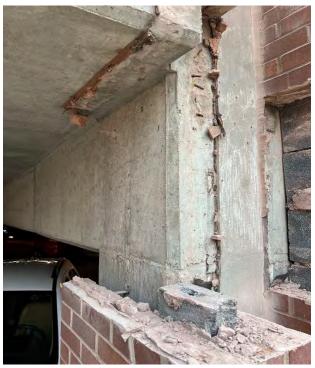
Column 19A inspection opening at Level 2 PT beam end (brick veneer at concrete block infill removed).
